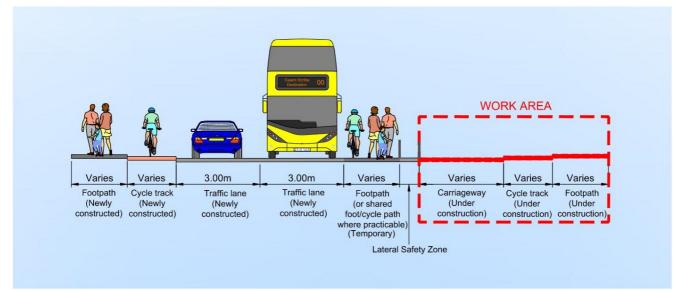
Traffic Management Cross Section, Section 4a – Stage 2
